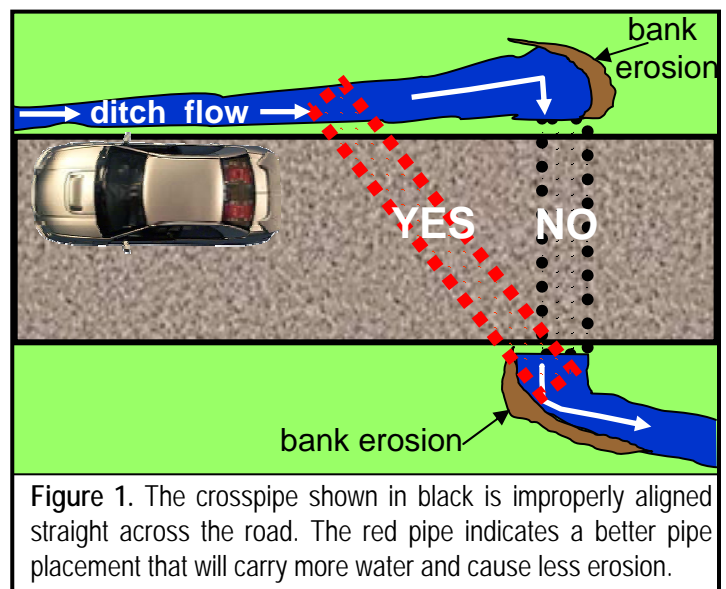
The crosspipe shown in black is improperly aligned straight across the road. The red pipe indicates a better pipe placement that will carry more water and cause less erosion.
